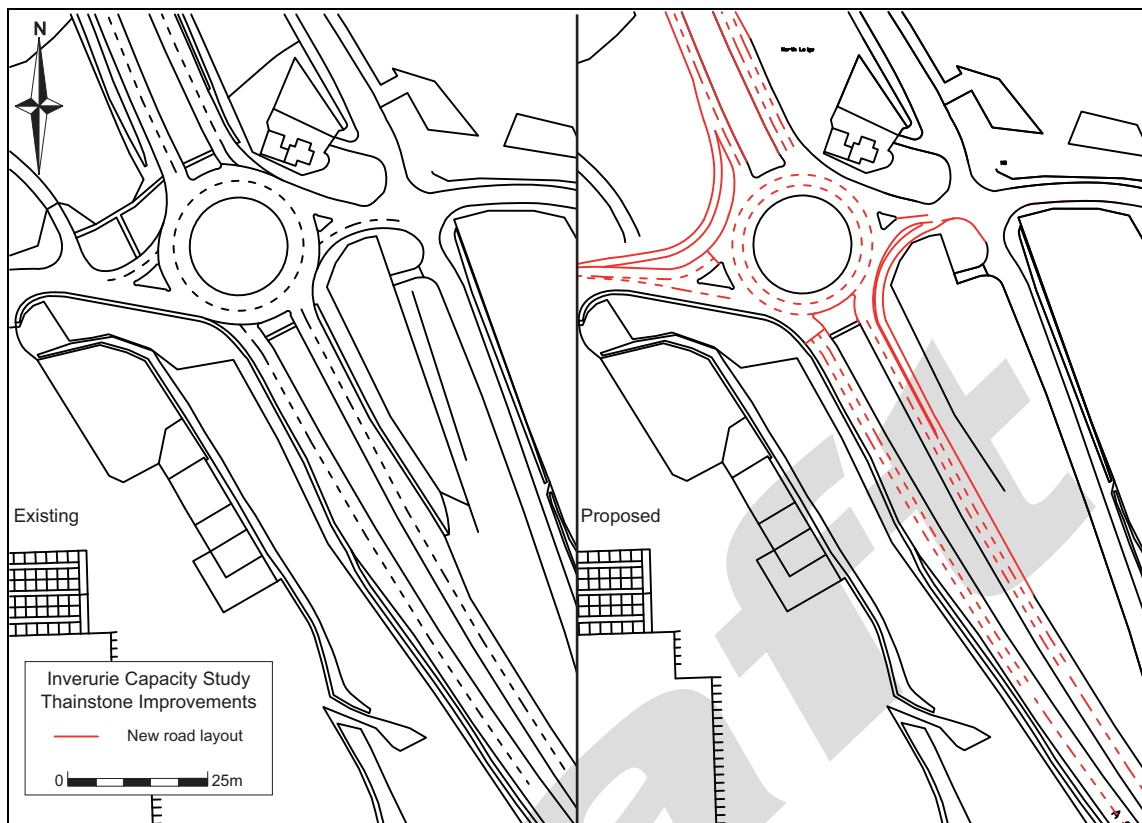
Thainstone Roundabout Upgrade compared to existing layout
